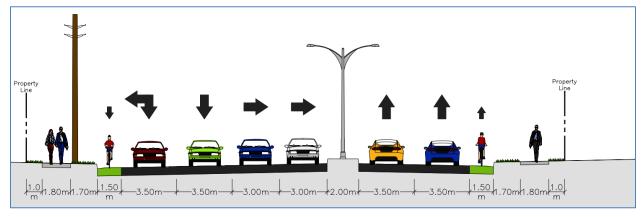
Preferred Design, Hamilton Road Cross-Section - East of Highbury Avenue
